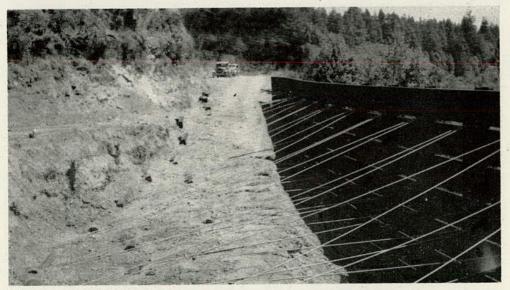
Timber retaining wall with tie-rods. Unstable foundation precluded use of conventional retaining wall. Lateral support provided by steel cables anchored to deadmen in firm material in slope above the wall. Embankment constructed above this wall near Guerneville, Calif., has been stable since construction in 1939. (Courtesy of California Division of Highways)
